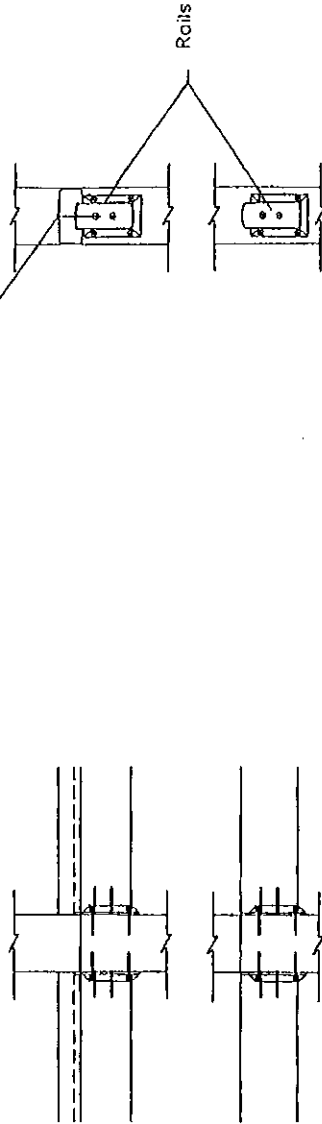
Exterior Connection: Rail Fastened To Post With Hanger Bracket
